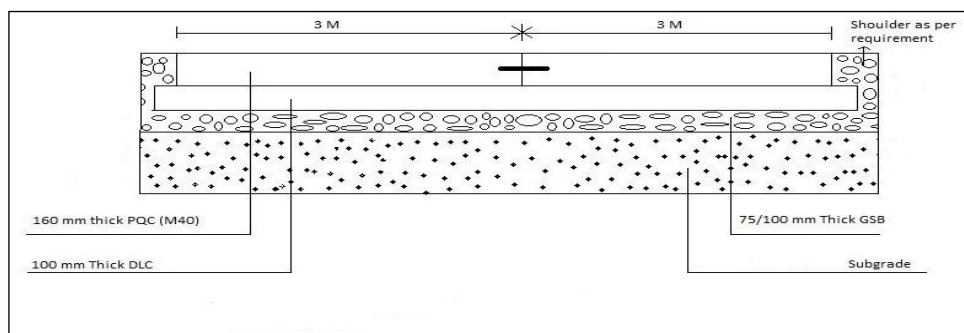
Cross Sectional details of 3 m x 6 m conventional concrete pavement
